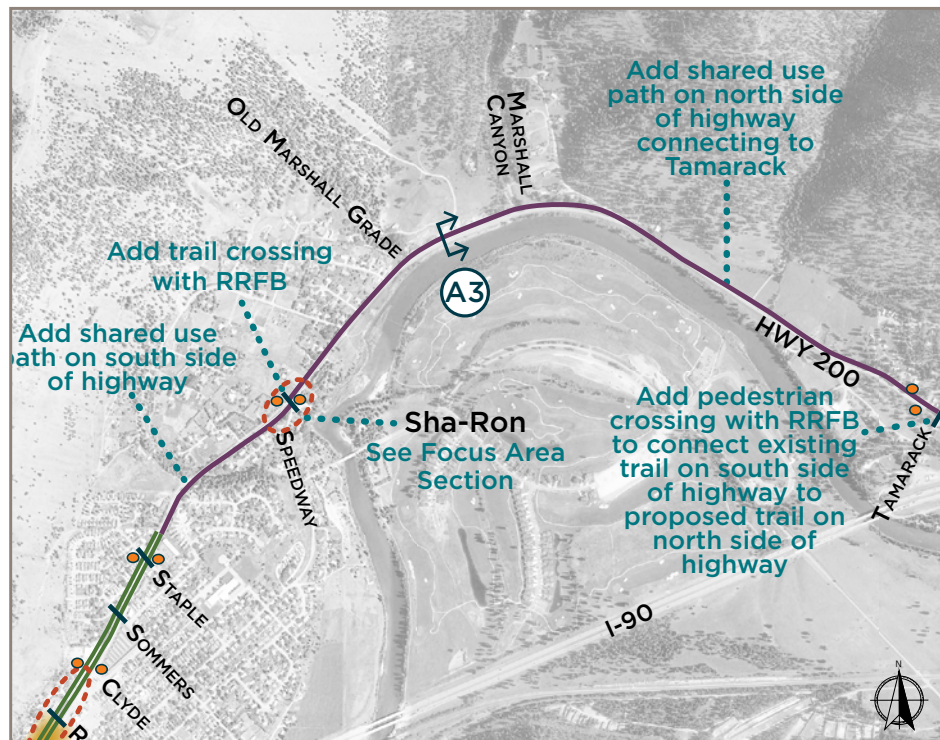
Alternative A Plan - Sha-Ron/Marshall Segment
